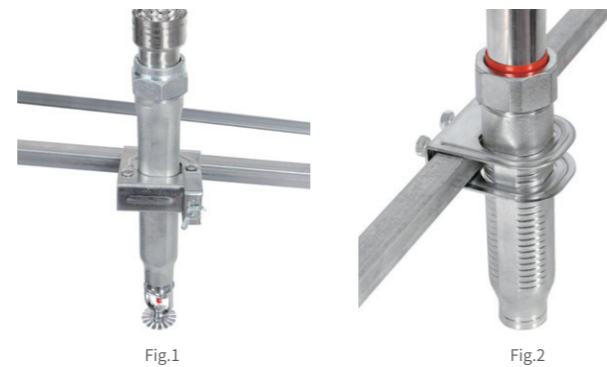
Move the center bracket to the desired location. Bend the hose and place the outlet of the hose in the center bracket. Adjust the height of the outlet to make sure the nozzle is in the correct position. Close the outlet and center bracket as shown and tighten the bolts with torque 4 N·m(3ft-lbs).
